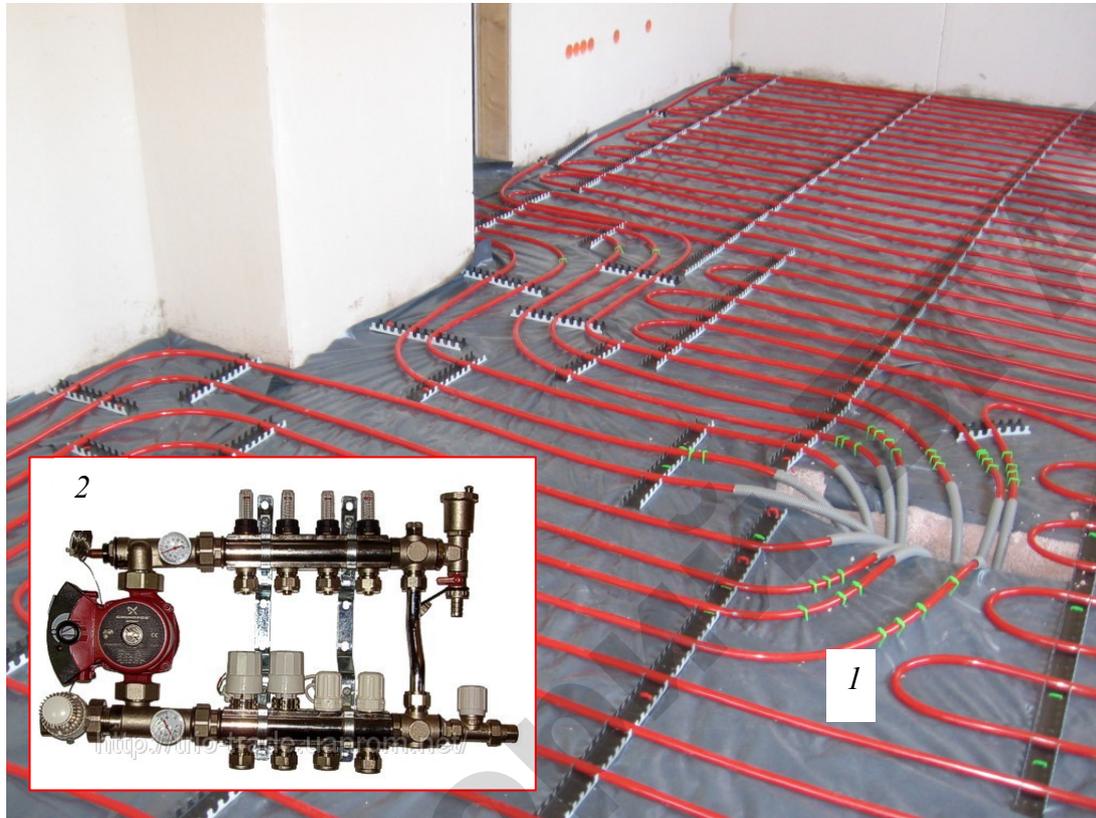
Heated floor's installation in the premises with the use of a heating cable:
